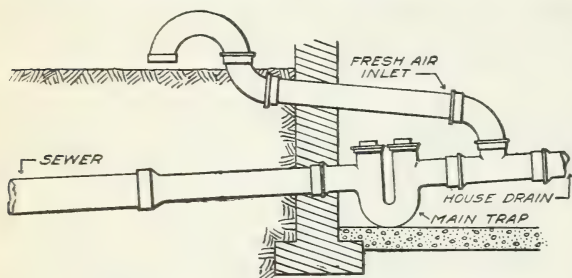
Sewer trap at house foundation, showing ventilator.
